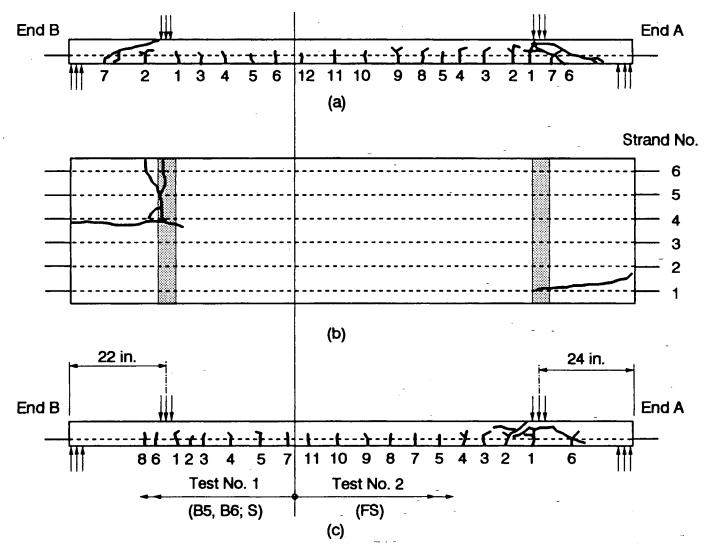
Crack patterns for D-type Specimen No. 12-6.0DC-1:
